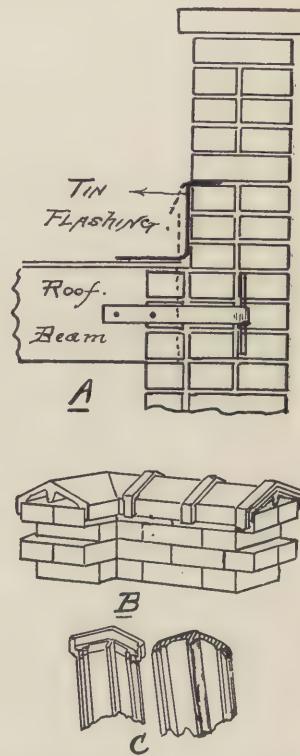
PARAPET WALLS COPED WITH TERRA COTTA AND STONE.
